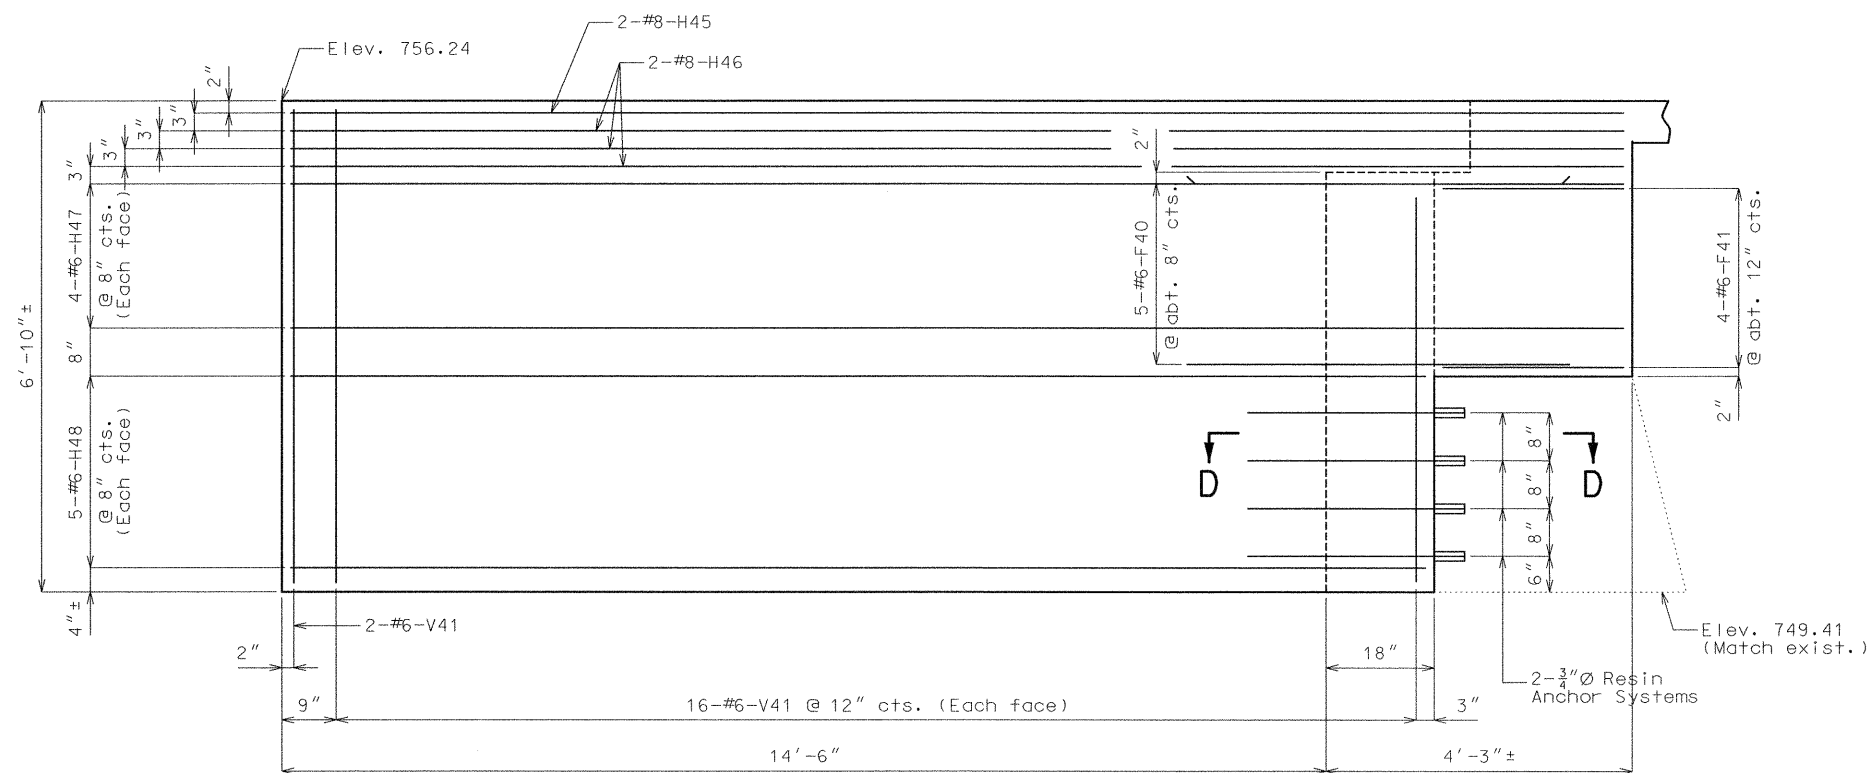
DETAILS OF CONCRETE REMOVAL @ END BENT NO. 10
